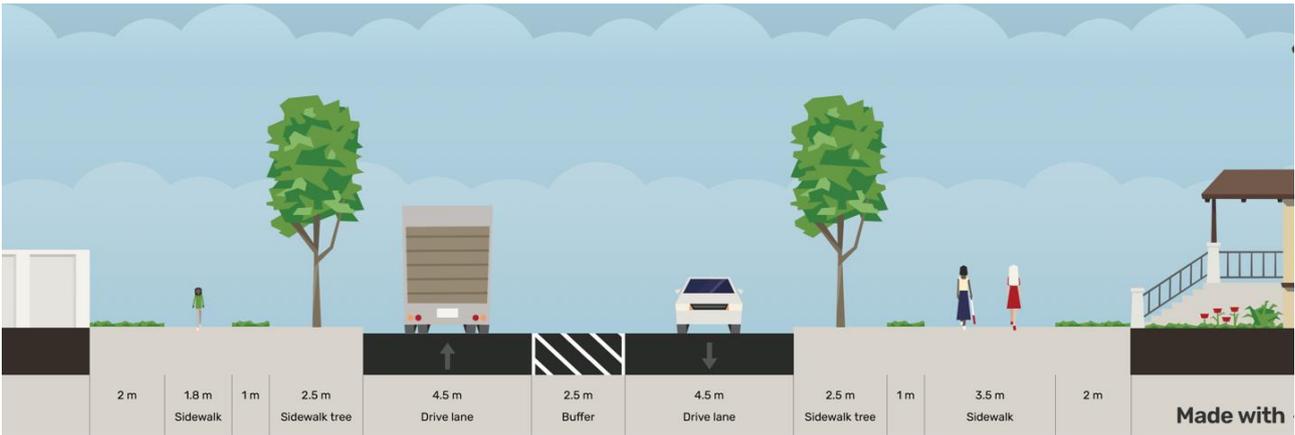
Indicative Typical Cross-Section – Spine Road (27.6 m wide)
